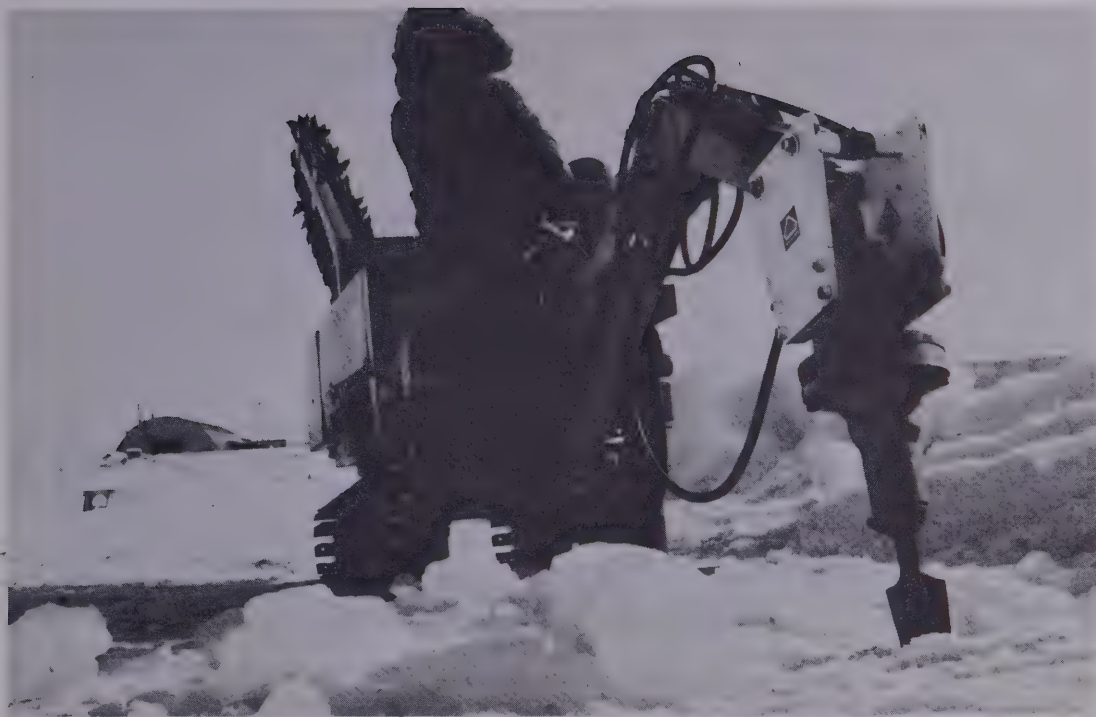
Impactor attachment with frost spade working tool excavating anchor pit on ice sheet surface.
